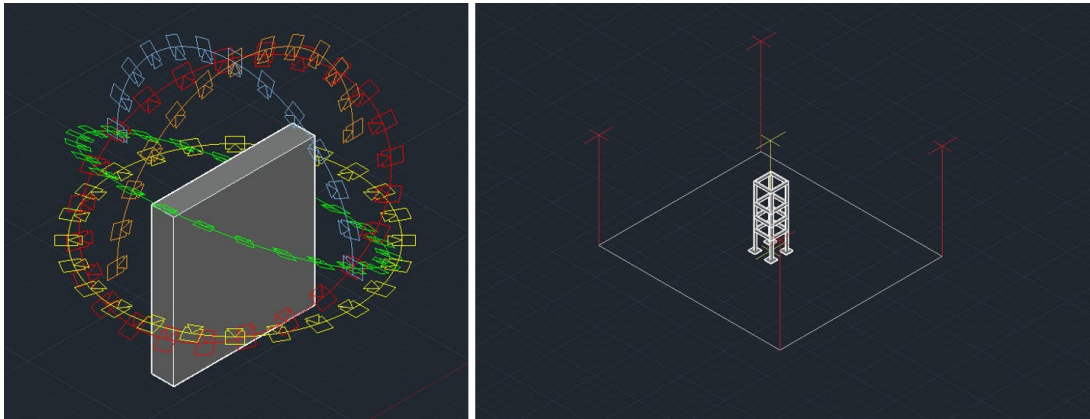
Axonometry of the photographic (left) and laser (right) shooting project for the concrete slab and the steel frame.
